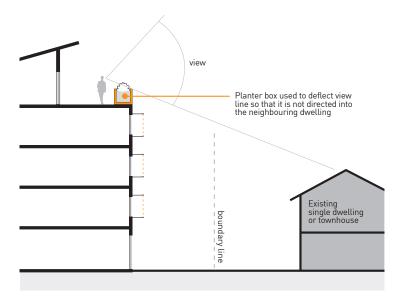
C.18-3: Incorporation of planter boxes into walls or balustrades for visual privacy.
